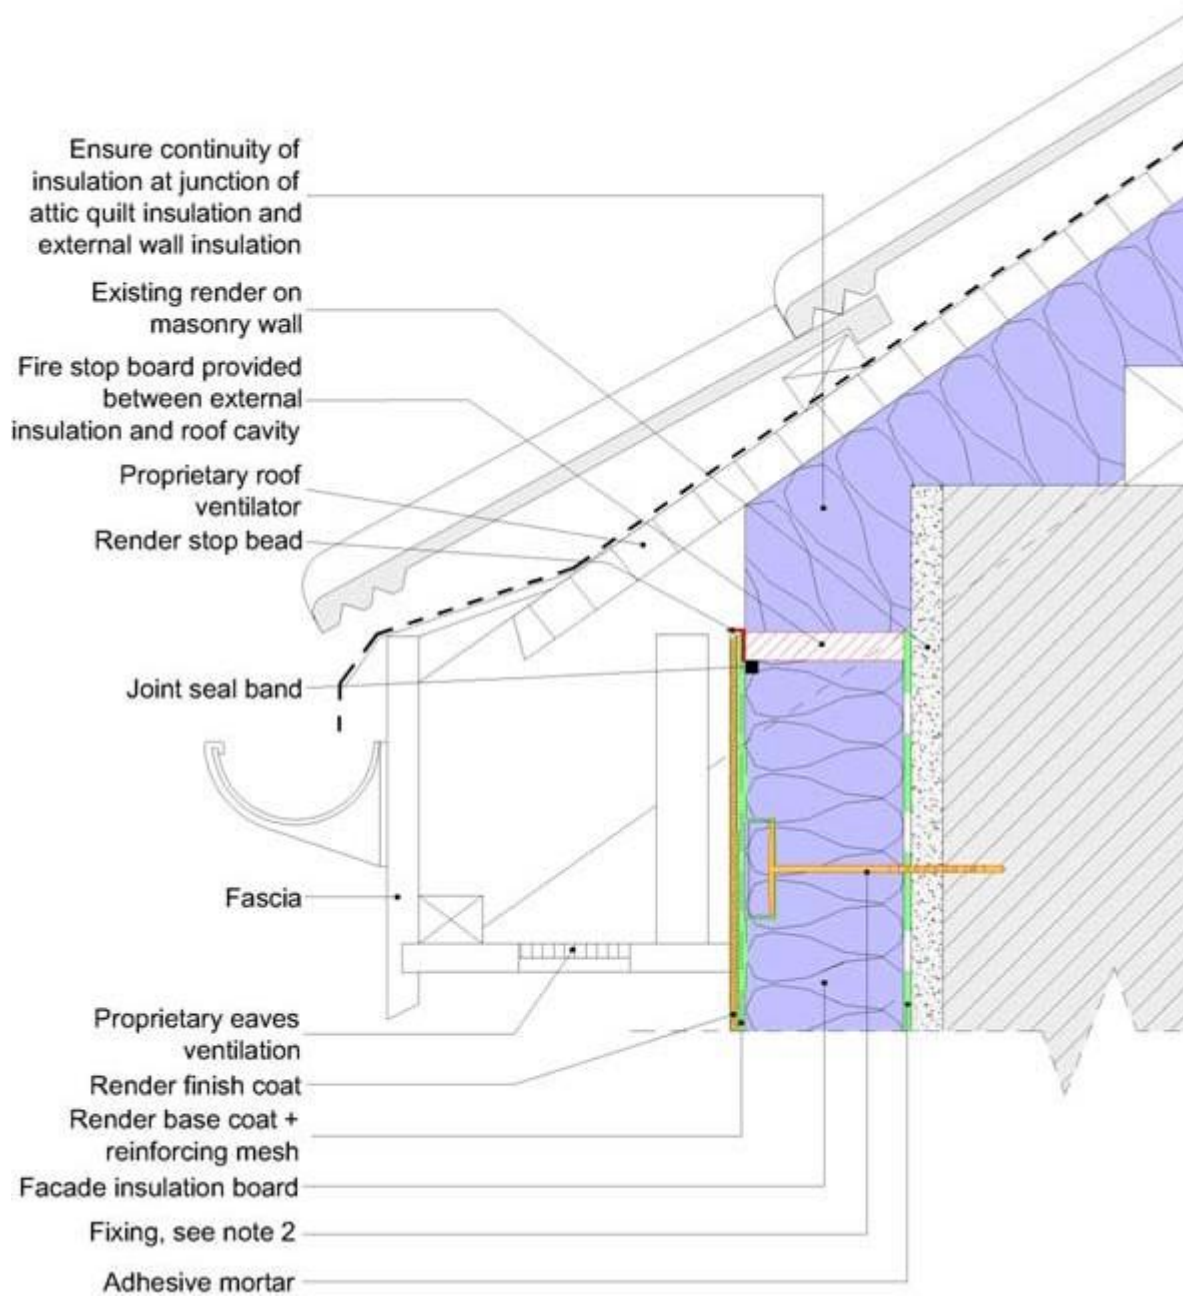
Typical Detail – Section Through Fire Barrier/Fixing
